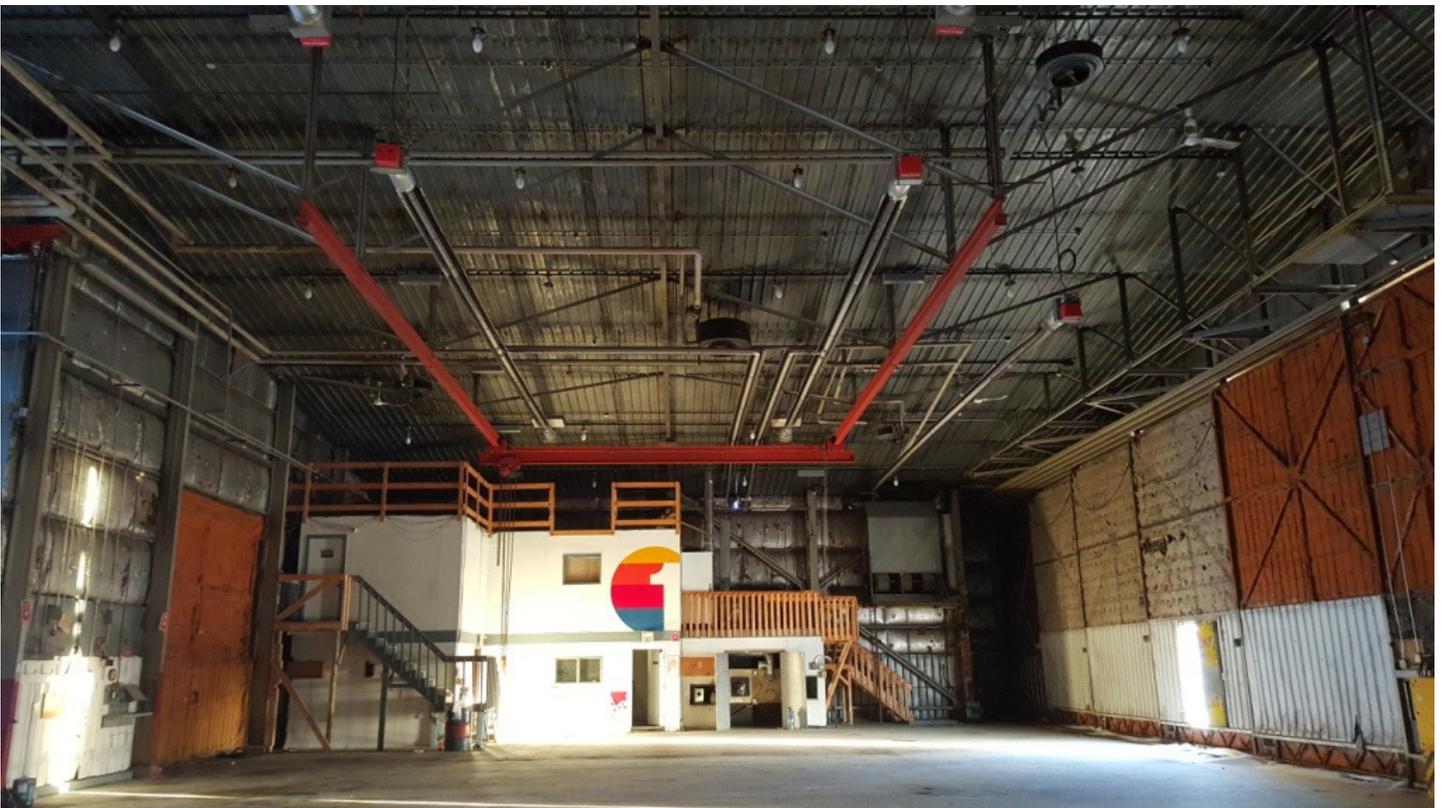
Overall Interior Elevation – Showing Roof Structure and Roof Supported Equipment.
